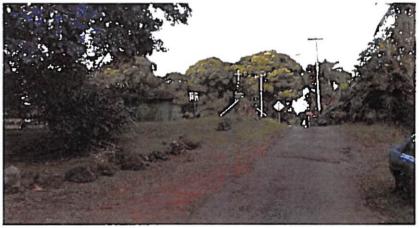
West View of Lower Nāhiku Road Toward Nāhiku Church
